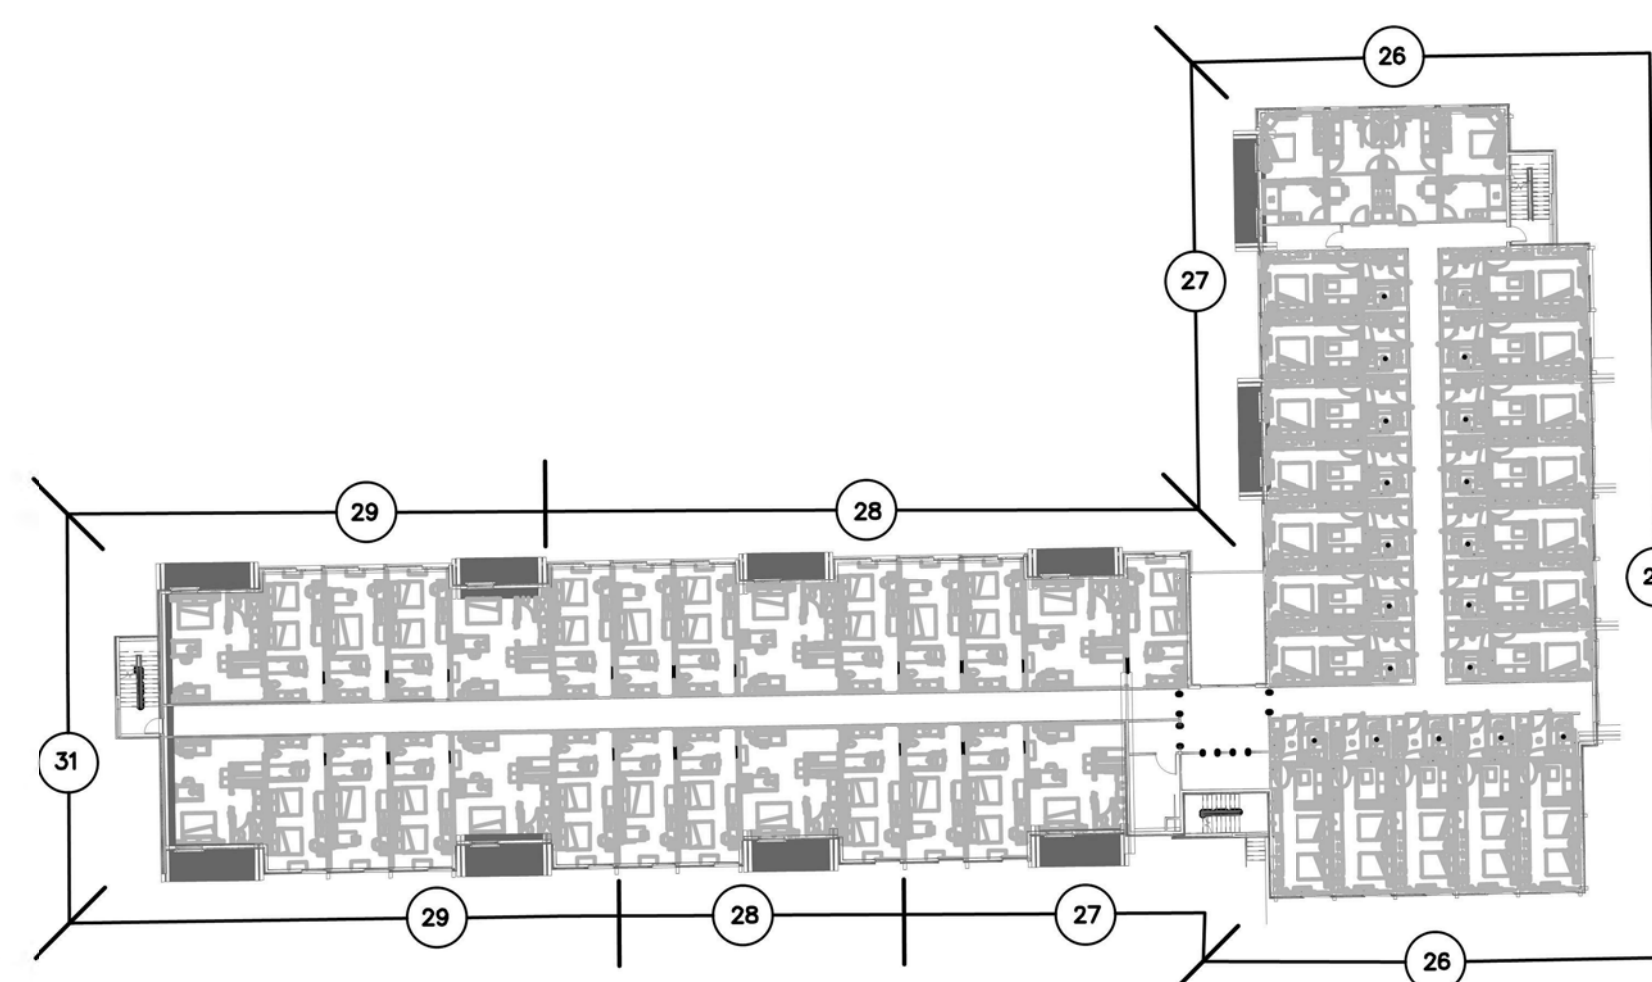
HILTON SAN RAFAEL MINIMUM RECOMMENDED OITC RATINGS FOR WINDOWS (FLOORS 3 AND 4)
